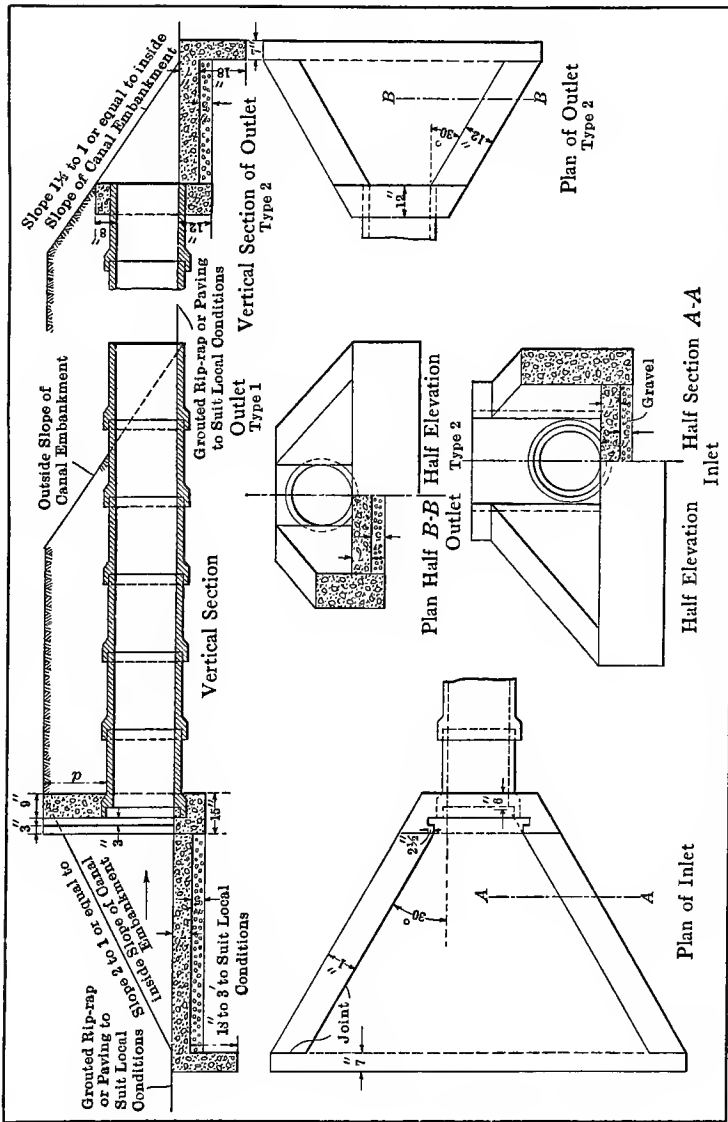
Turnout of vitrified pipe with concrete inlet and outlet.
